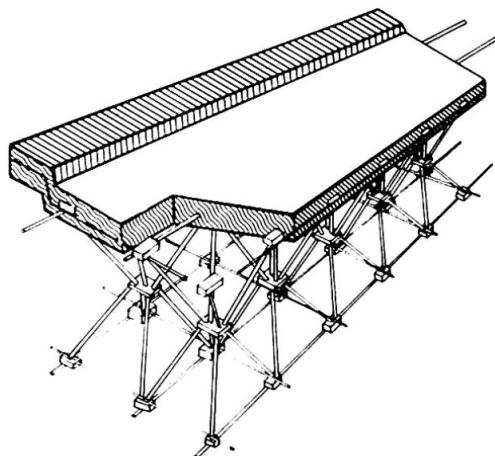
Isometric Detail of a Rural Spatiostructural Bridge (Sketch)
